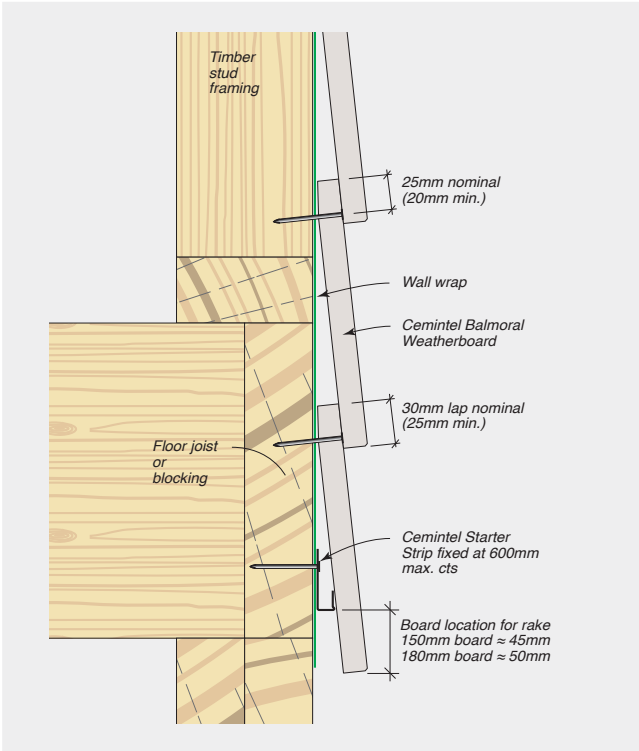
Typical Nail Fixing Direct to Timber Studs – On-Slab
